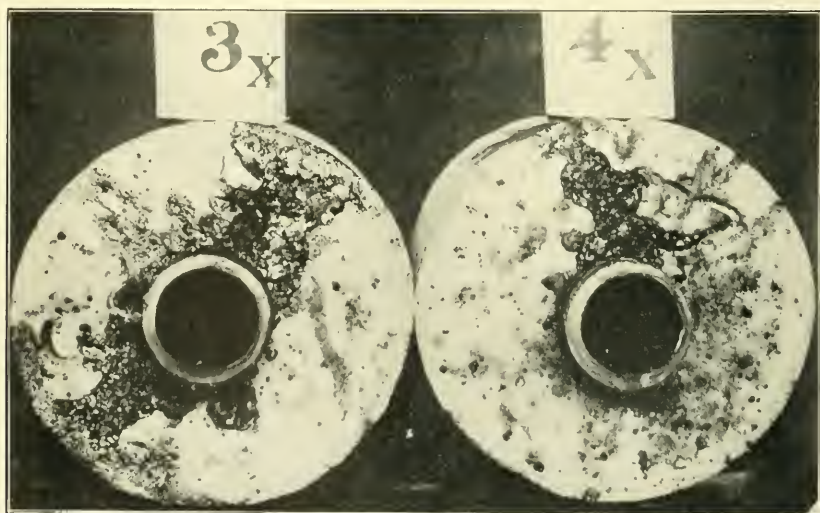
RUSTY DEPOSIT AROUND PIPE. SECOND SERIES.
